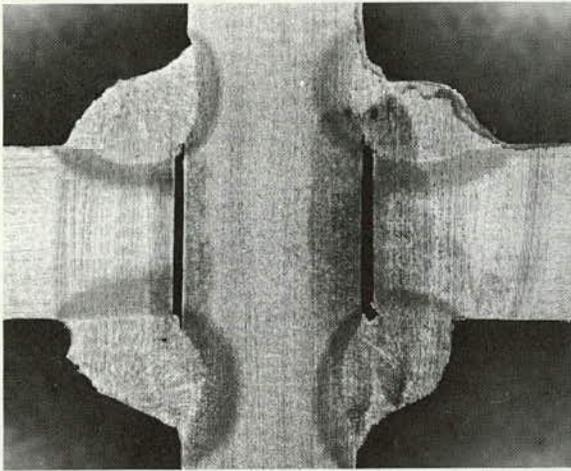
Gusset-stiffener connection adjacent to cope—beam 8 ($S_r = 12$ ksi), detail 1.
